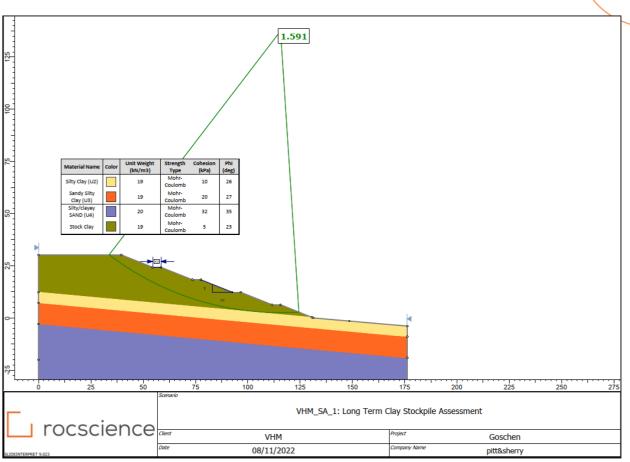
Example of Slope Stability Assessment for 30m high stockpiles
